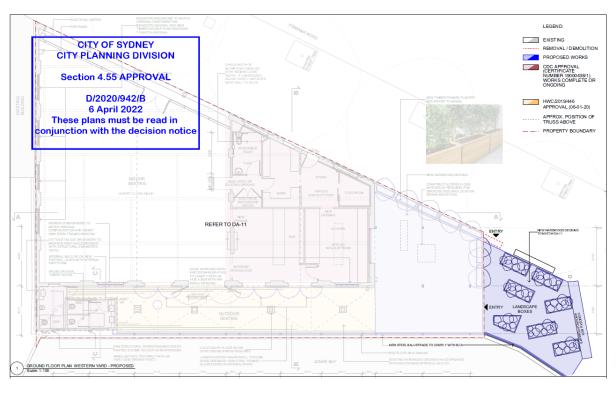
Extract of approved plan granted under D/2020/942, with the portion of the site located on 26-28 Pirrama Road shaded purple. This portion of the outdoor area contains landscape boxes which limits the useability of this area.
